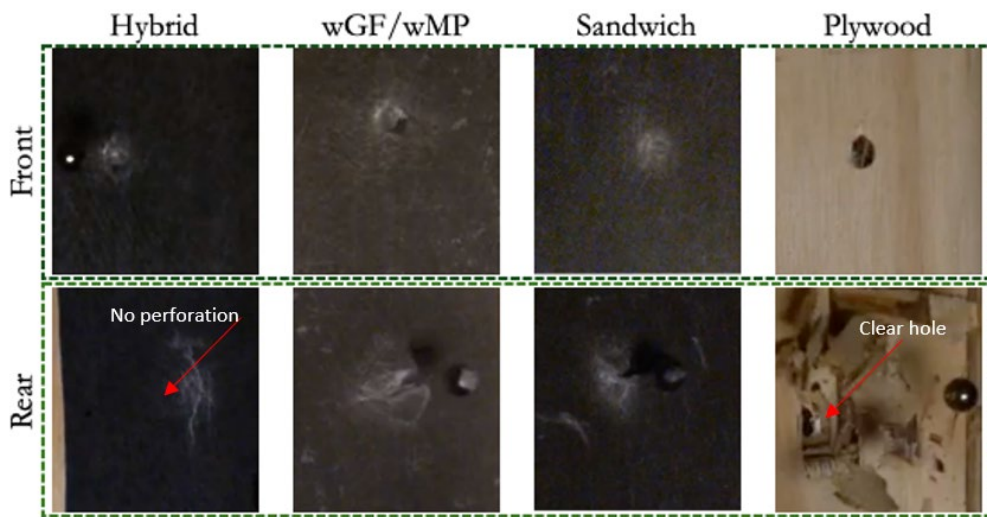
Surfaces of the front and rear faces of the tested specimens following impact.
